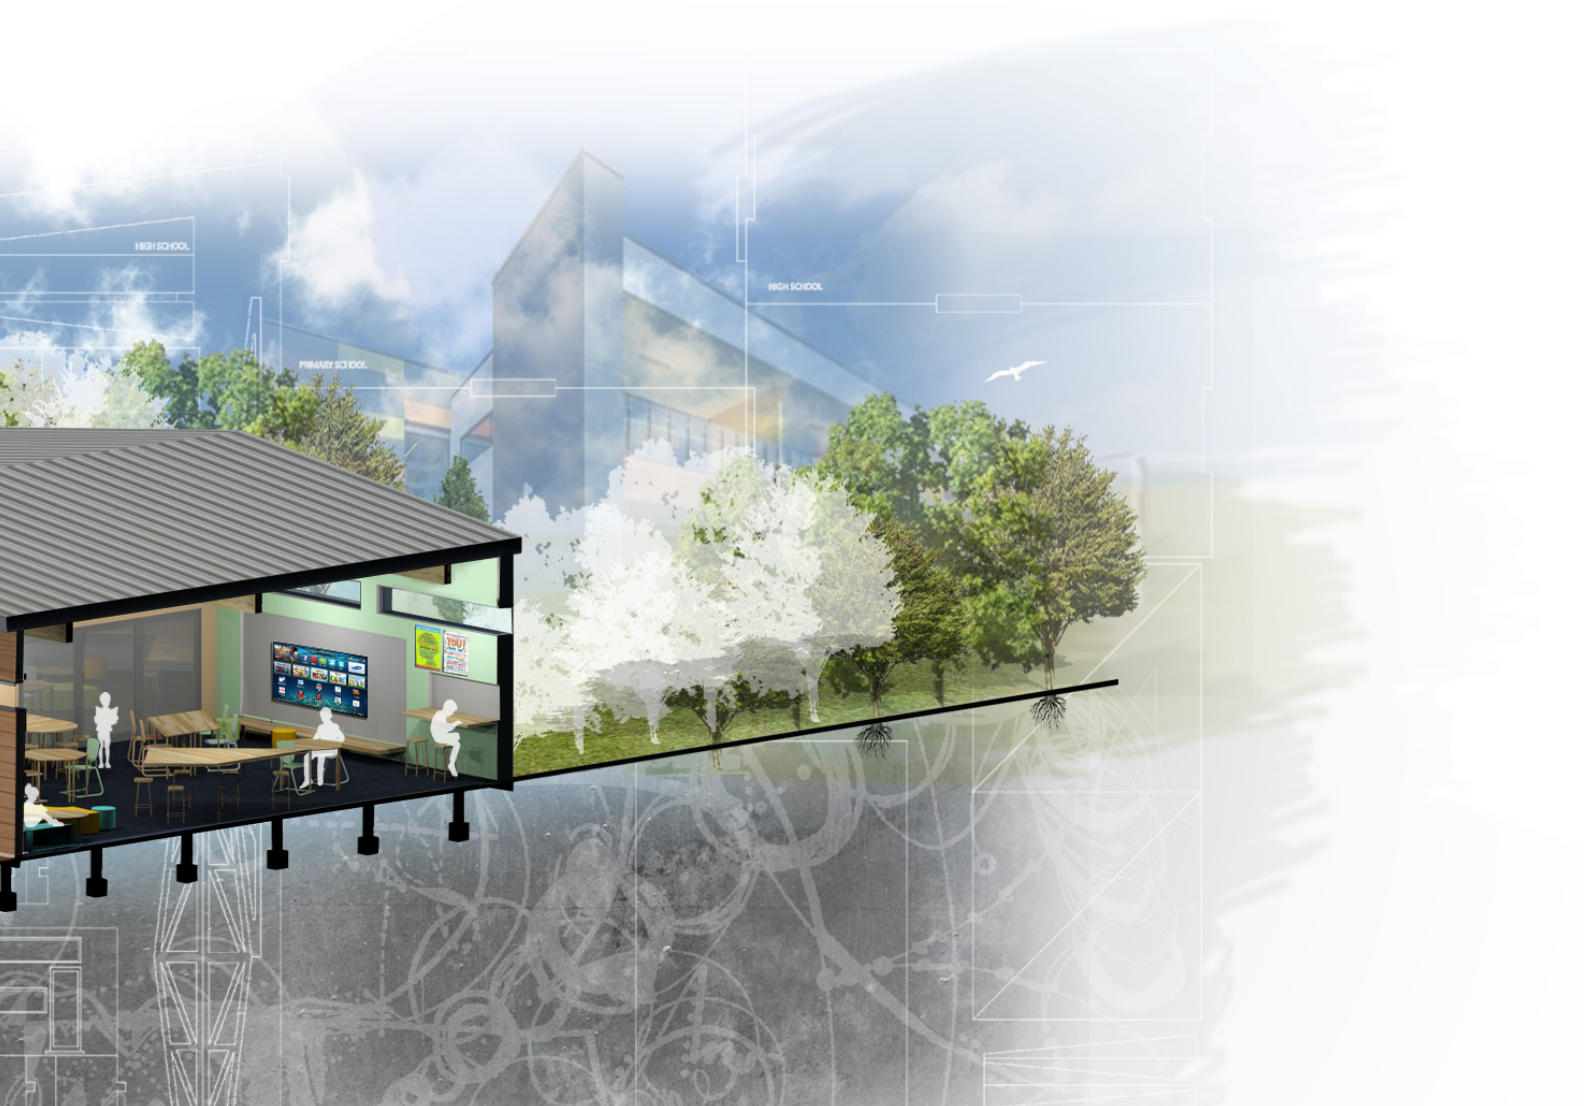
Site section: Displaying the relationship of interior, exterior and site on a typical school day.
